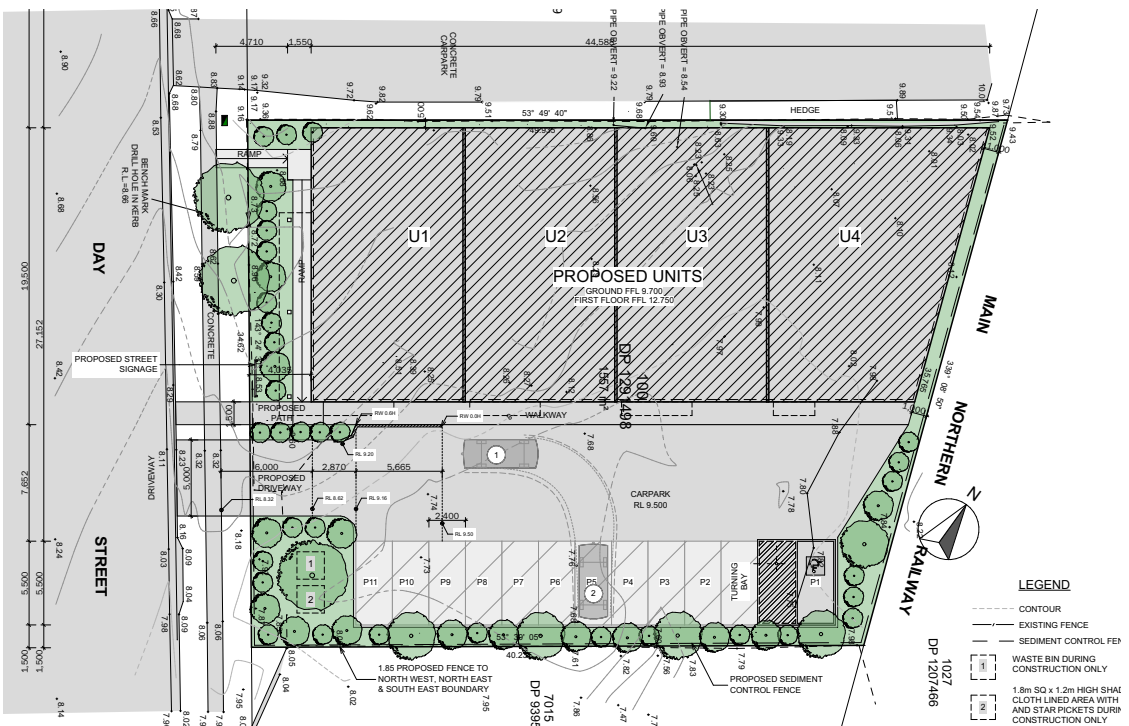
Proposed Site Plan source SORENSEN DESIGN & PLANNING
